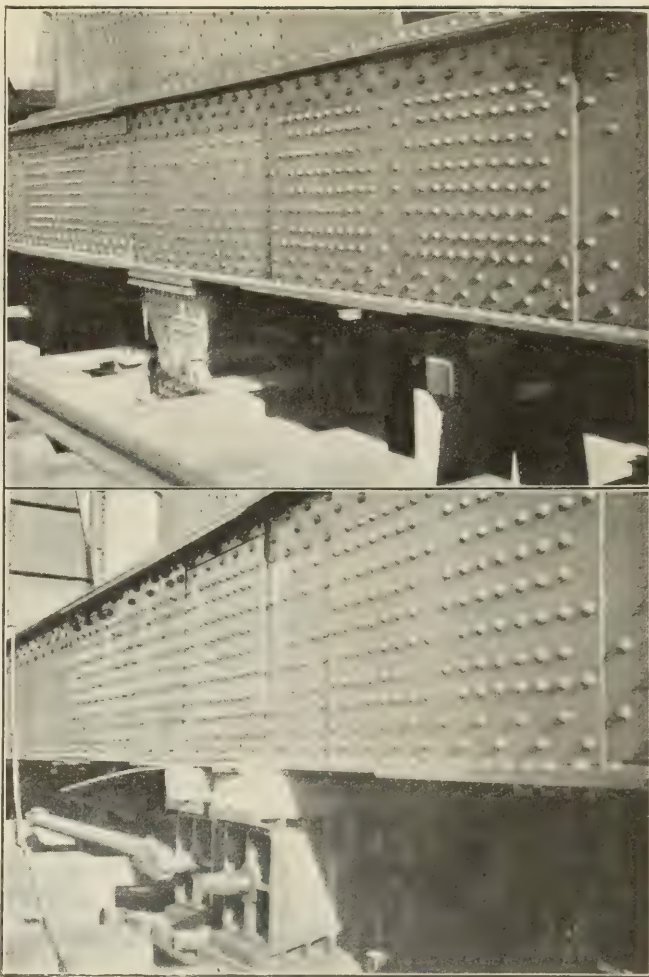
THE U-FLOOR BEAMS SEEN FROM THE CENTER PIER; GUSSETS OF L 20 AT LEFT
